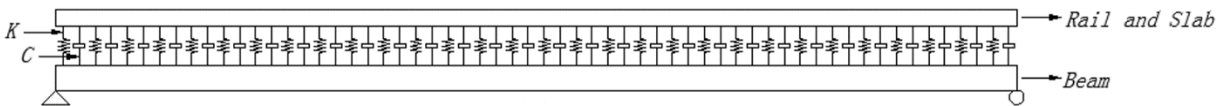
Mechanical model of bridge main beam with simplified floating slab track: a double-beam system.
